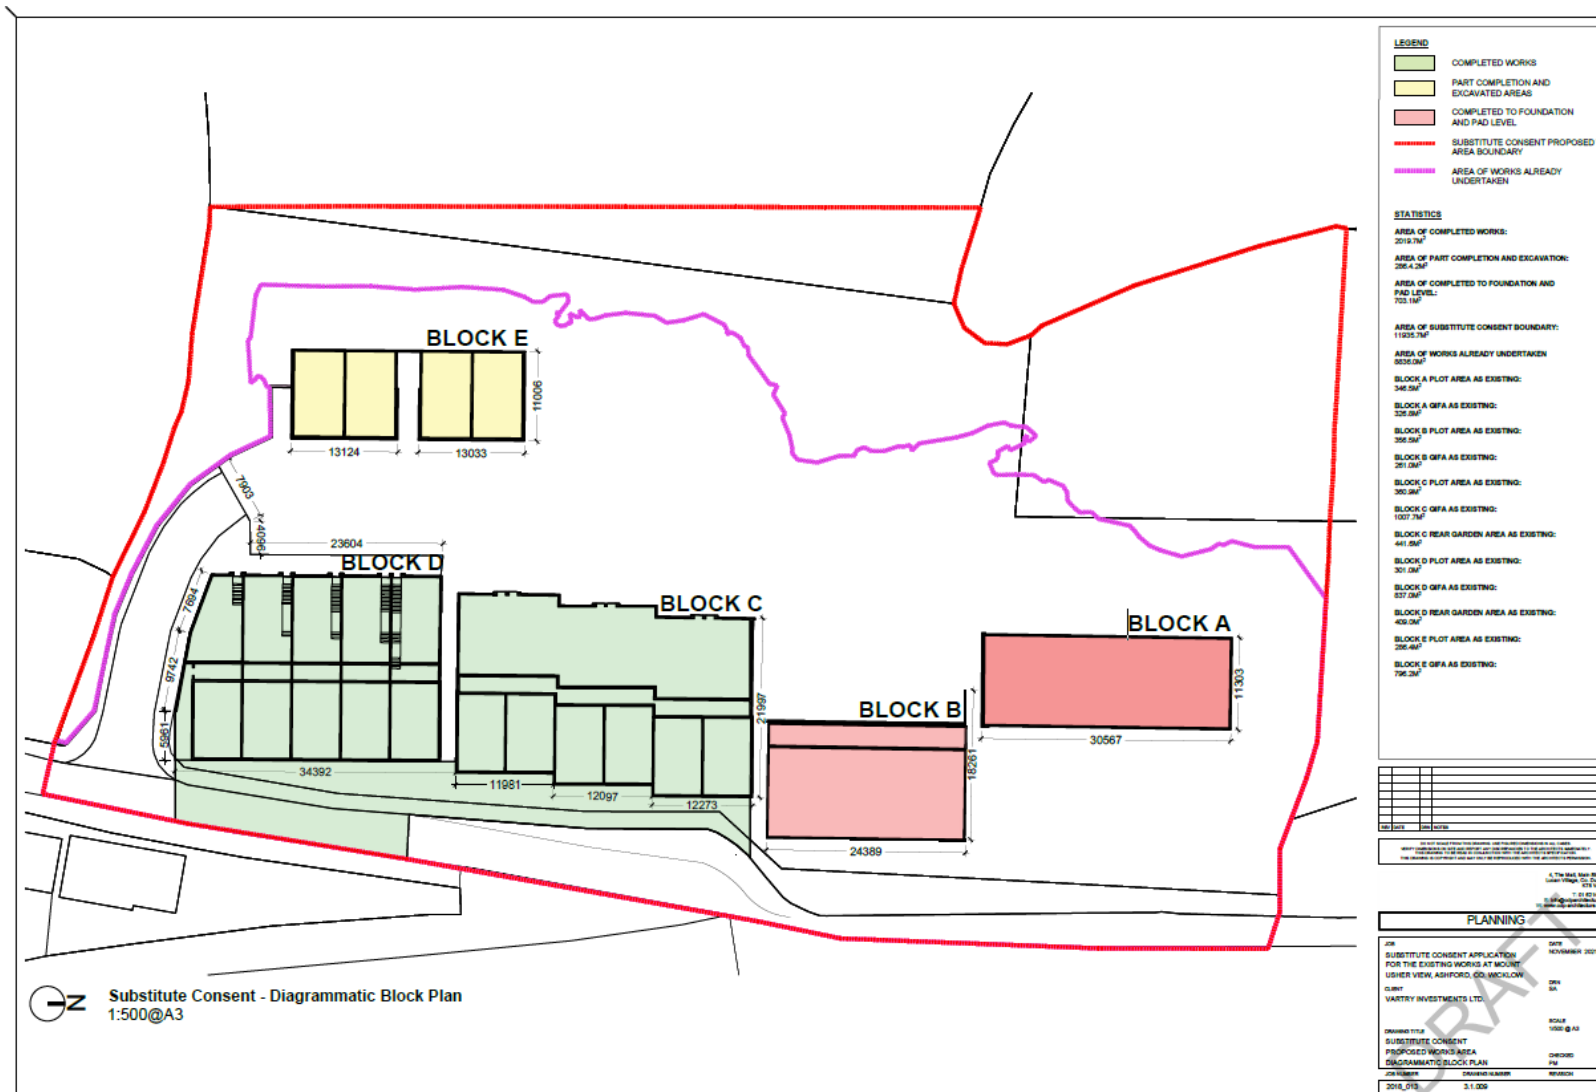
SITE LAYOUT (CDP ARCHITECTURE, 2021)
